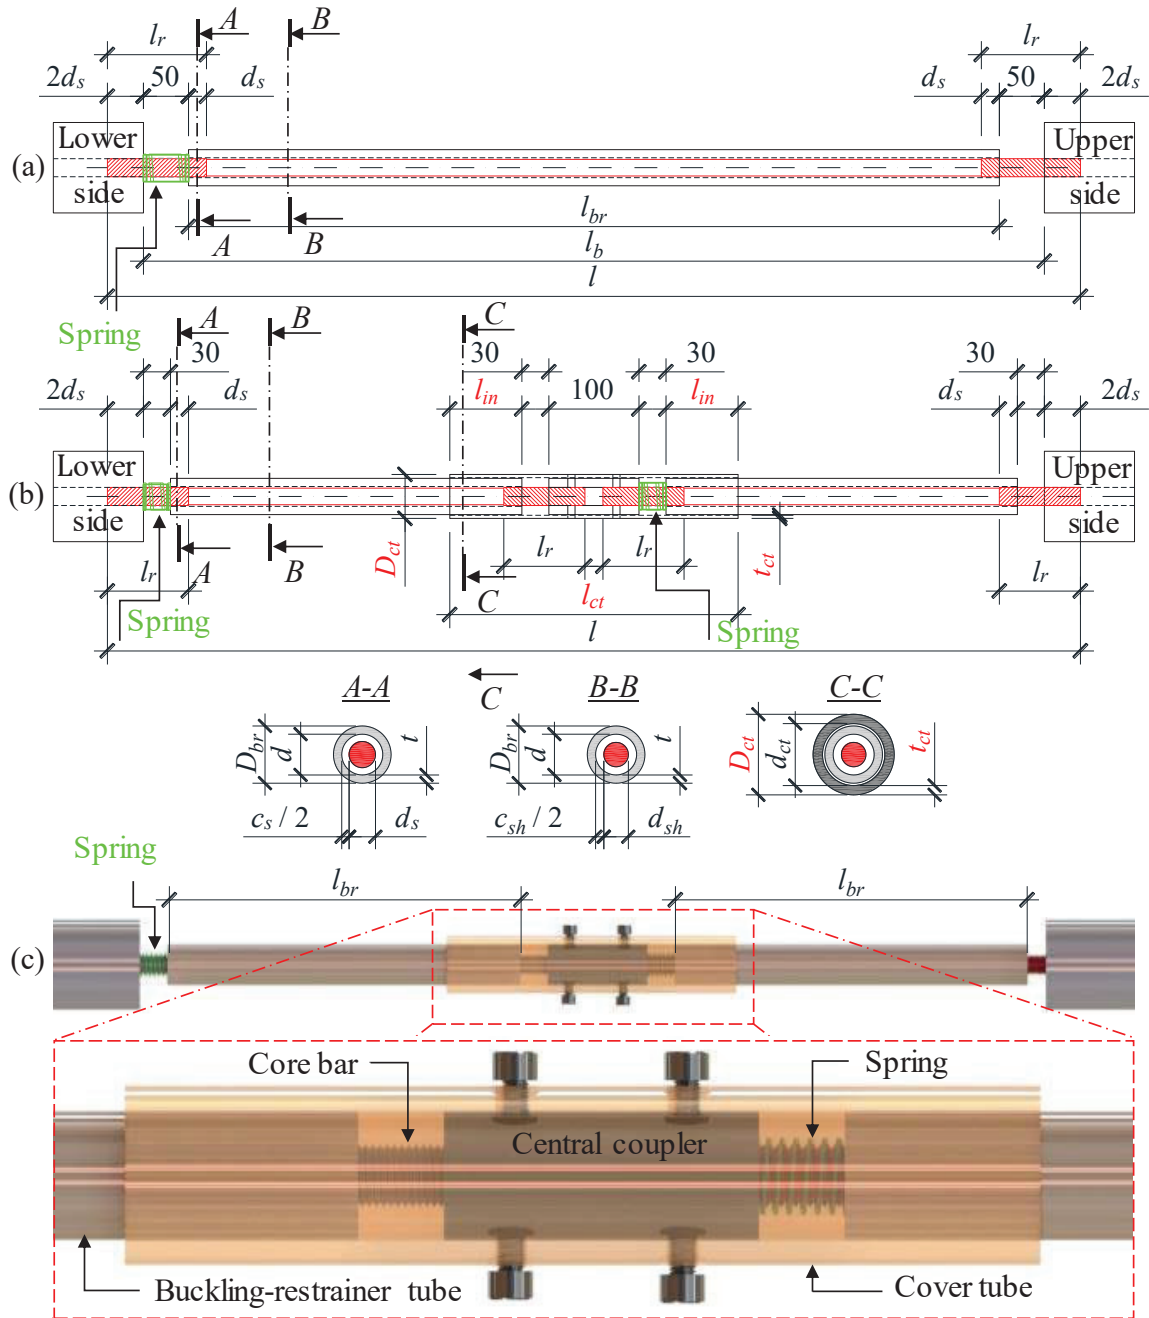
Geometrical parameters of the proposed BRKB dampers:
